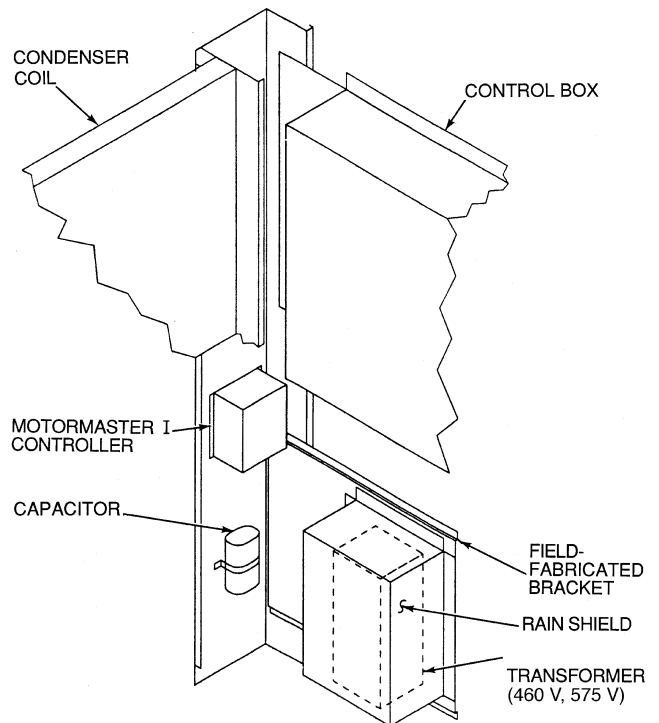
Mounting Motormaster® I Controller, Capacitor, and Transformer; Size 034-048 and 030-050 Units
